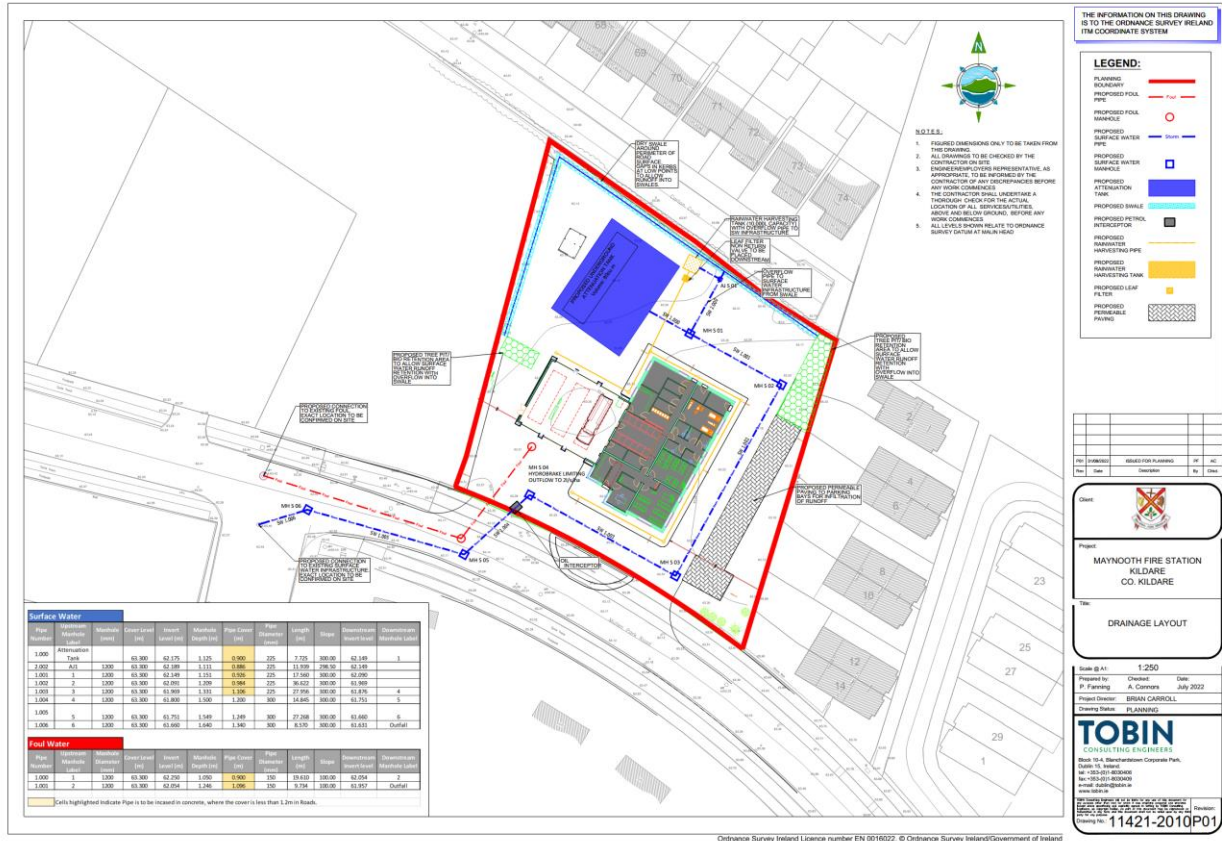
Proposed Foul Layout Drawing, 11421-2010
